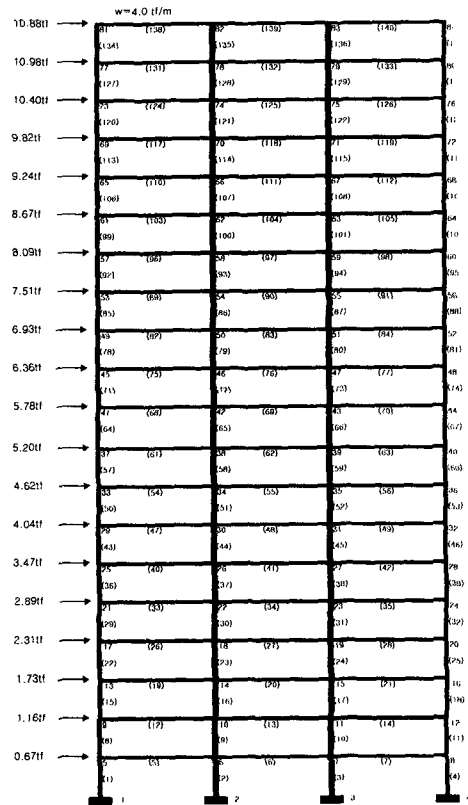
3-bay, 20-story reinforced concrete frame subject to gravity and lateral load (span=9m, story height=3.6m).
